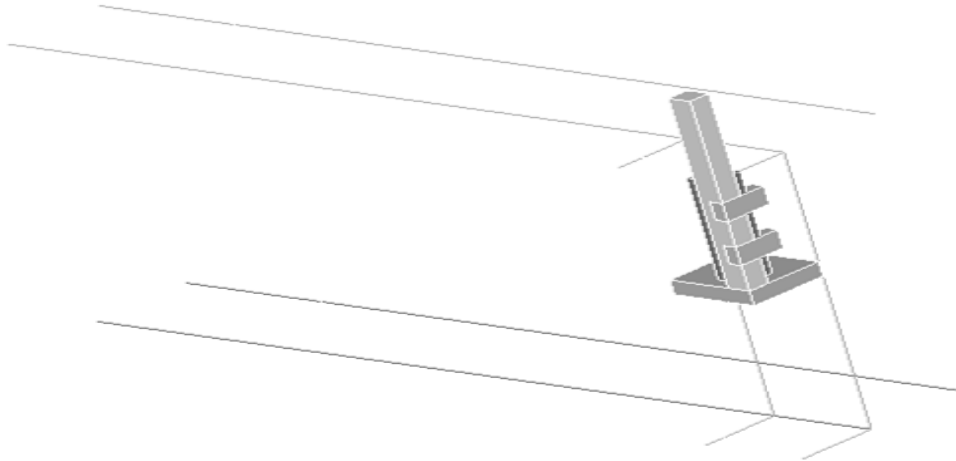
Anchor reinforcement configuration in one quarter of beam
